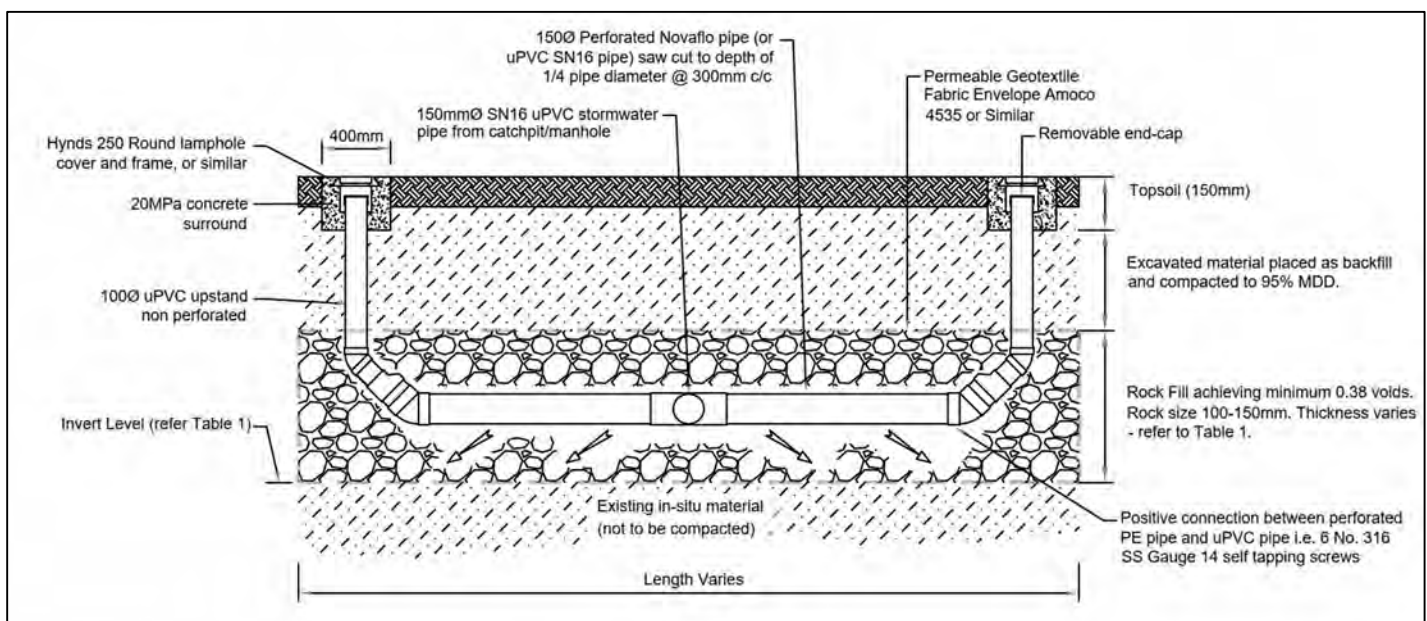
Soak Pit for Dwellings – Rock filled (Cross-section View)
